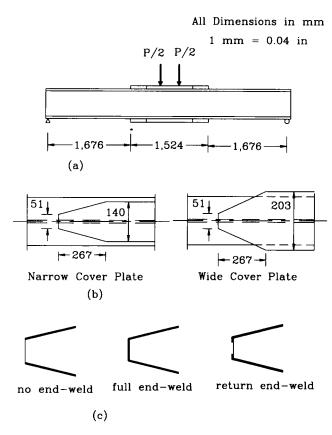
Specimen dimensions and cover plate details: (a) specimen configuration and dimensions; (b) cover plate end details; (c) end weld conditions.
